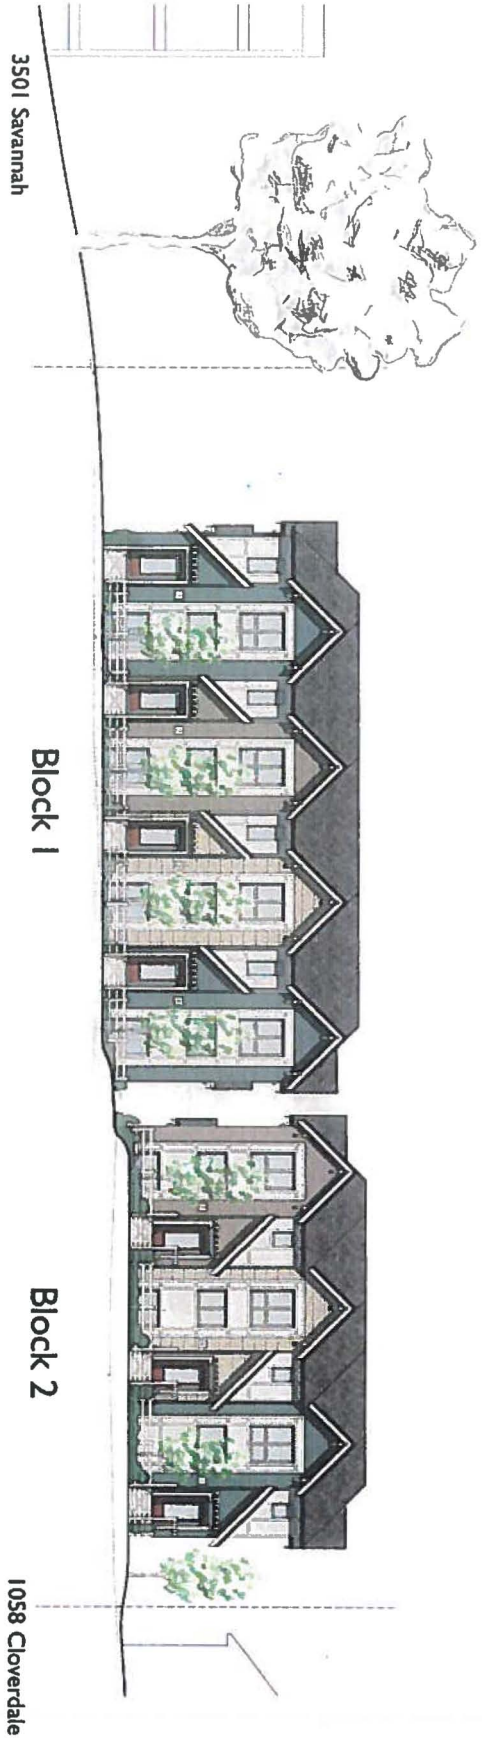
Streetscape Elevation (from plans by Outline Home Design)
